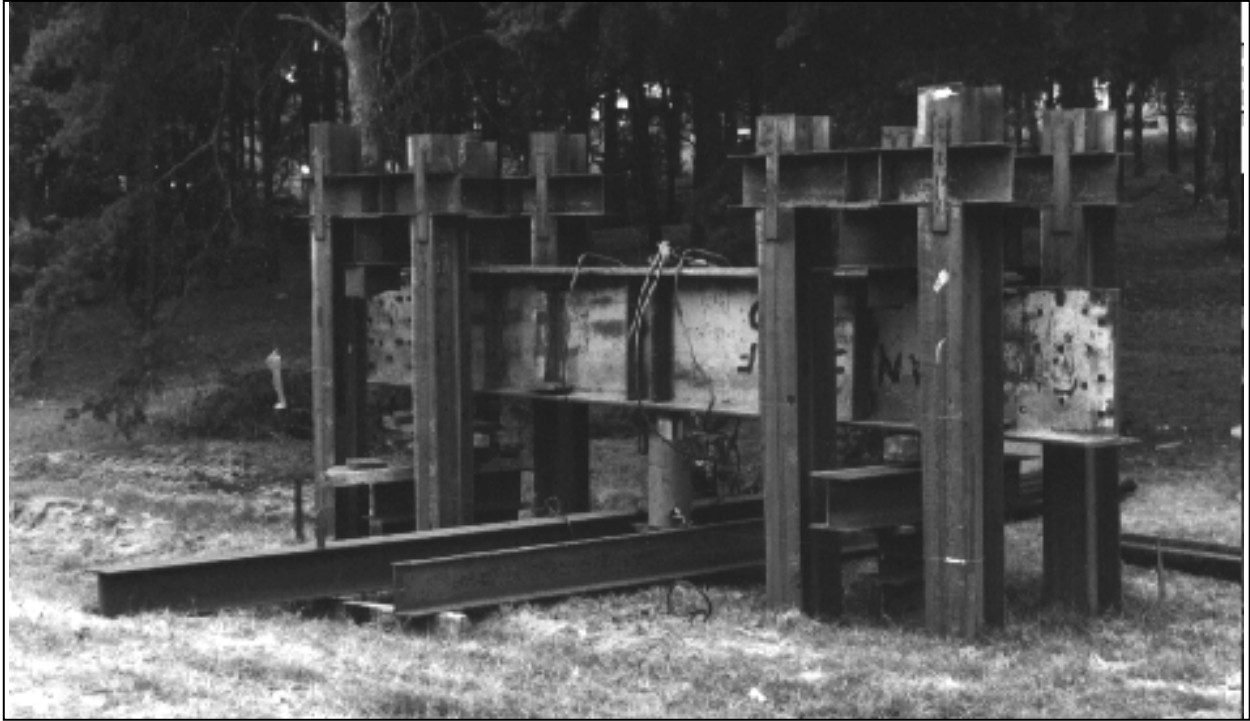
Typical Compression Load Test Arrangement with Reaction Piles
